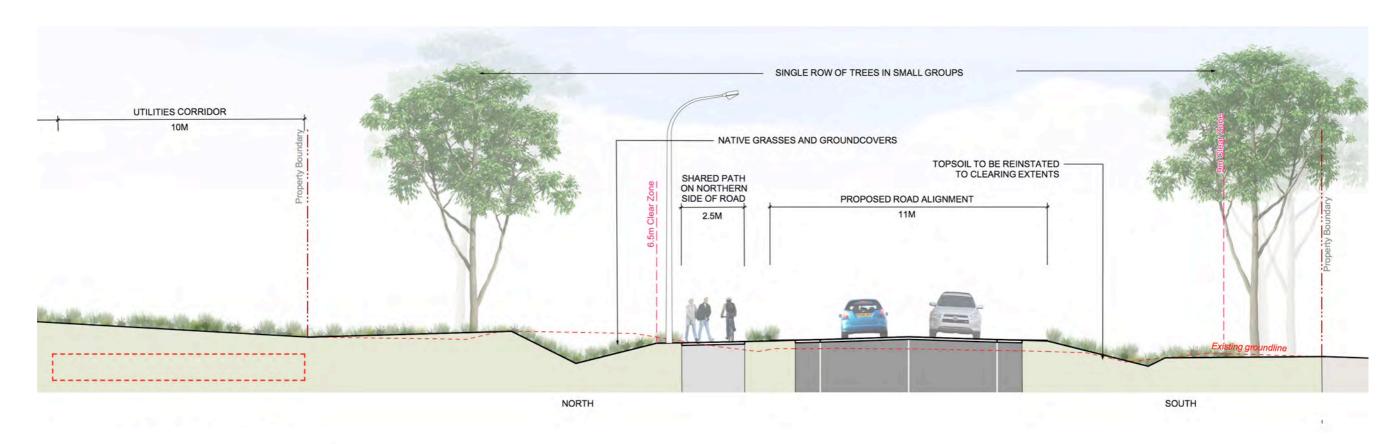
Typical cross section of Parkway treatment in Zone 1, shown at station 3,400
